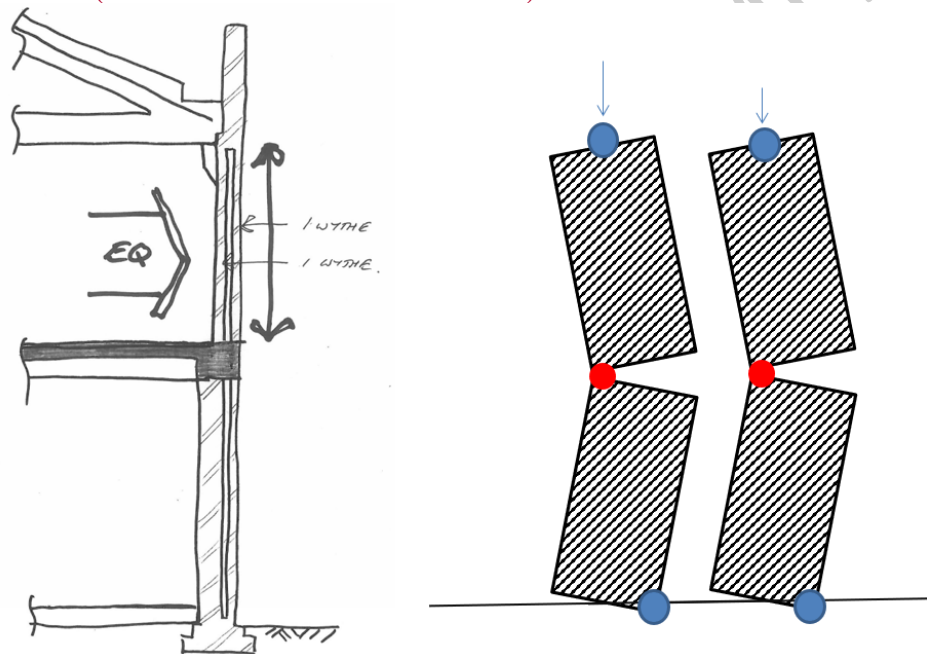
B.29: Boundary conditions for upper cavity wall with parapet above
